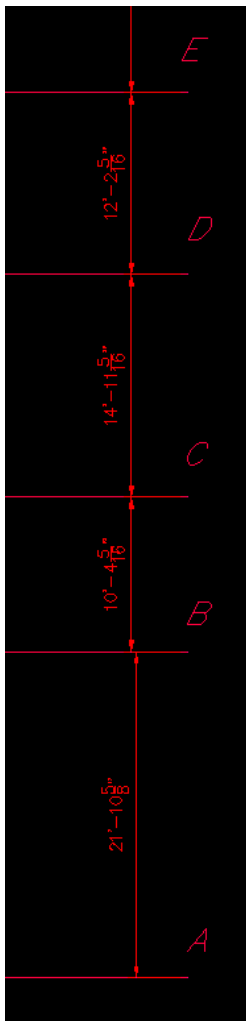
AutoCAD Dimensioning of Column Spacing (A-E)
